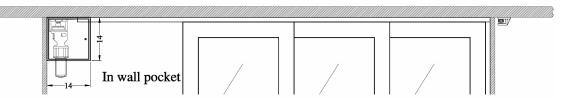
Motor Assembly and Access Panel Inside Door Pocket
